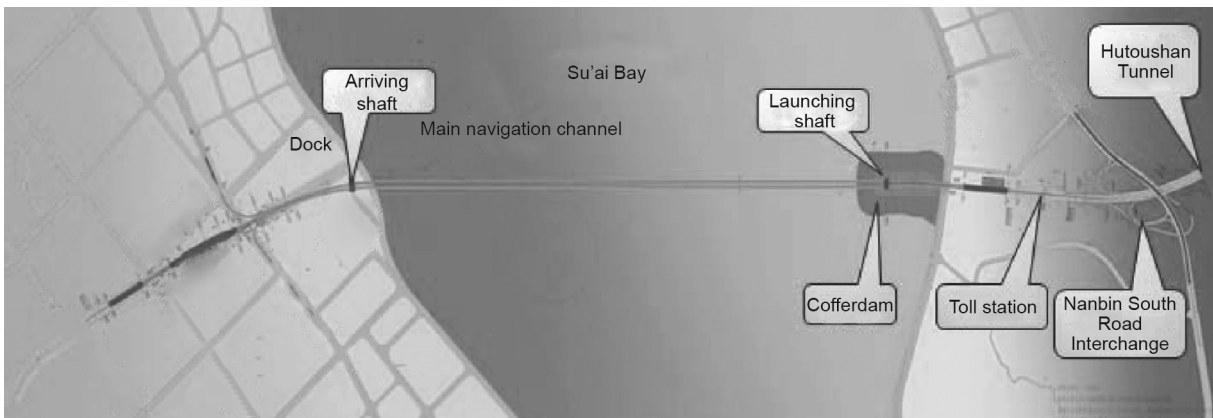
Plan layout of Su'ai Tunnel in Shantou.
